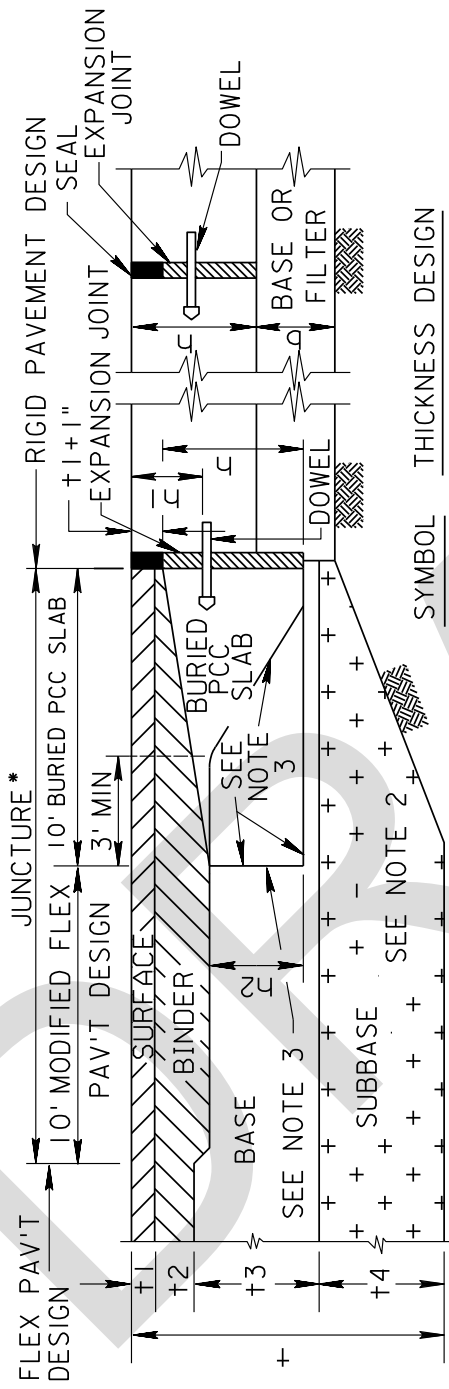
Rigid-Flexible Pavement Junction (Not for Air Force)
